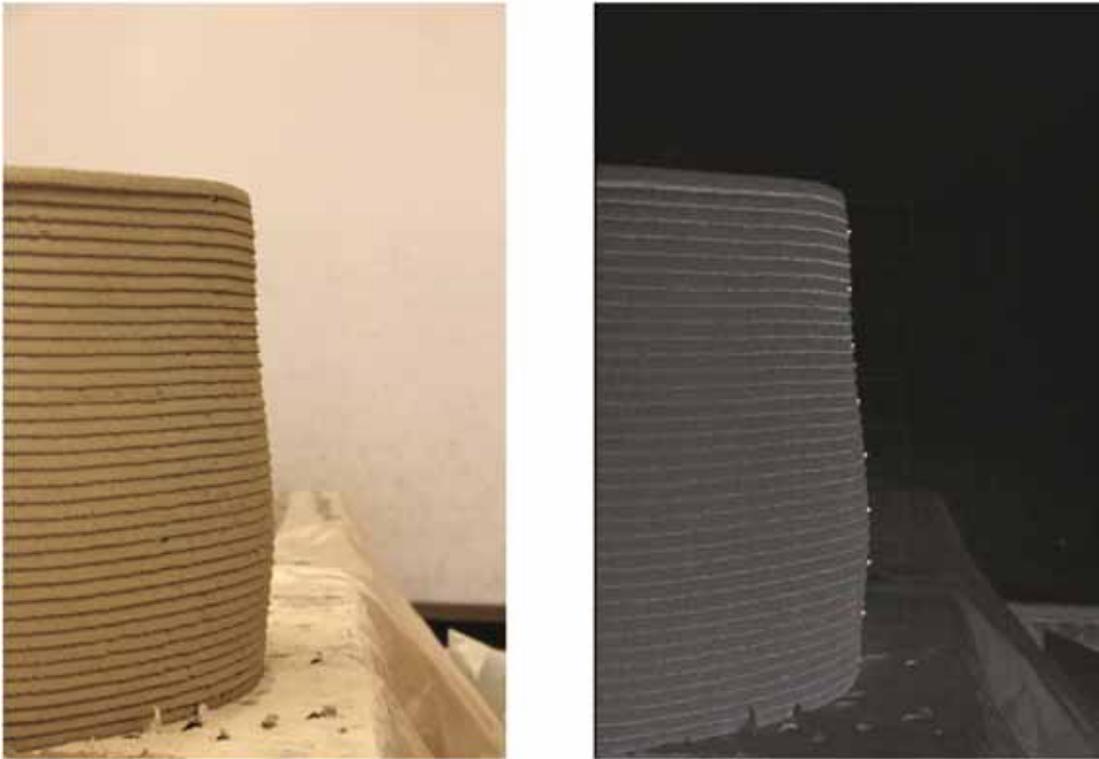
(a, b) Tracking deformations of a printed object with optical measurements.
